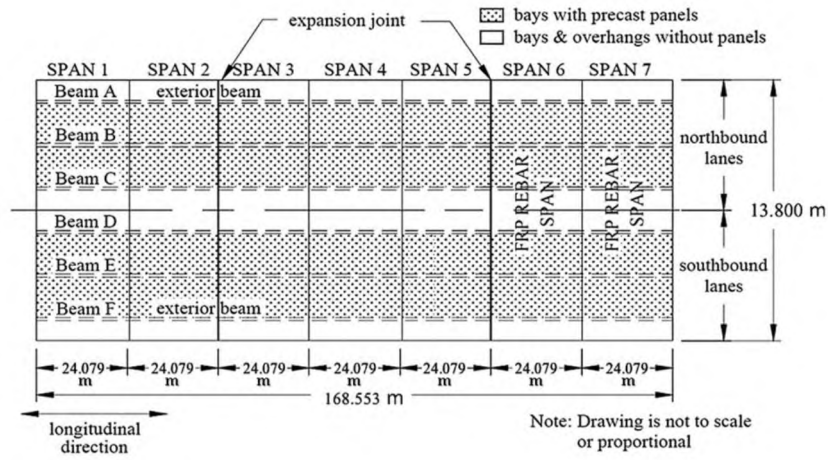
Sierrita de la Cruz Creek Bridge plan view
